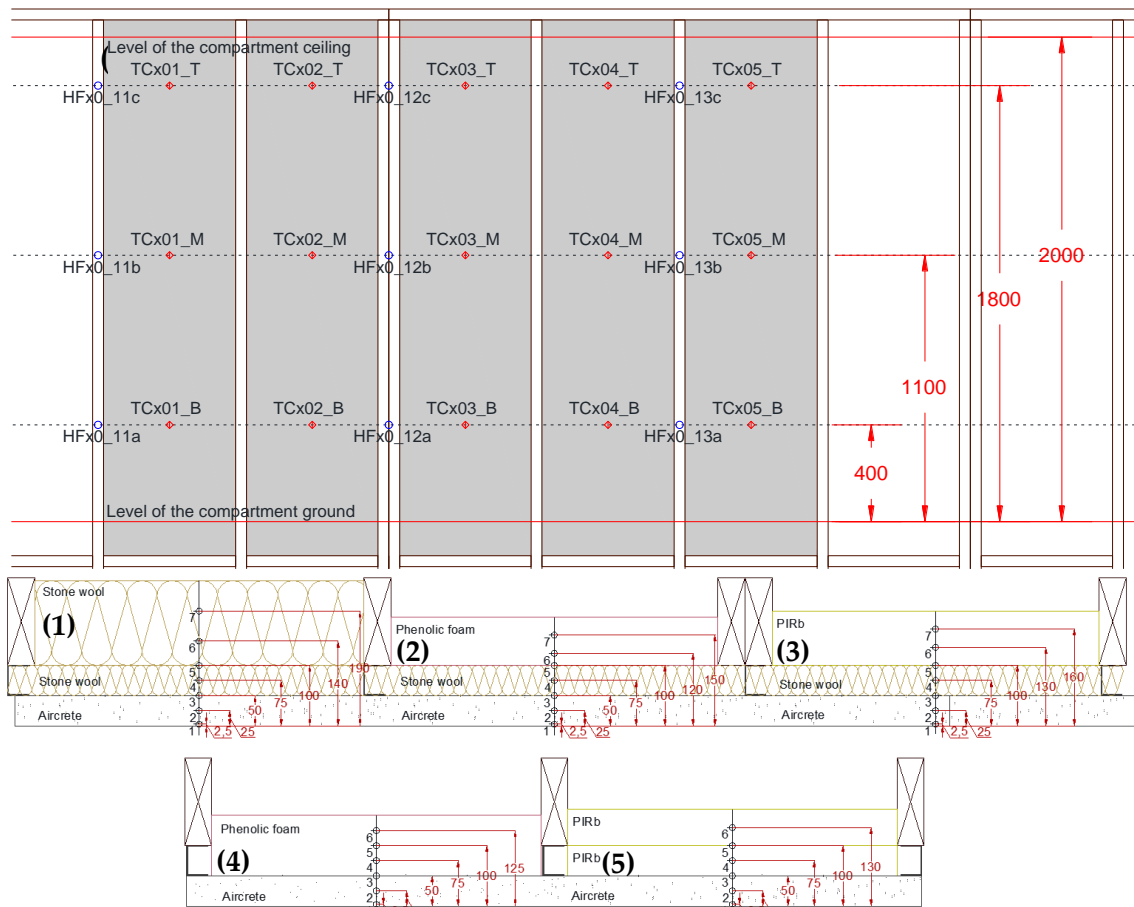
Section of the rear wall. The location of the instrumented wall sections is highlighted with different grey tonalities
